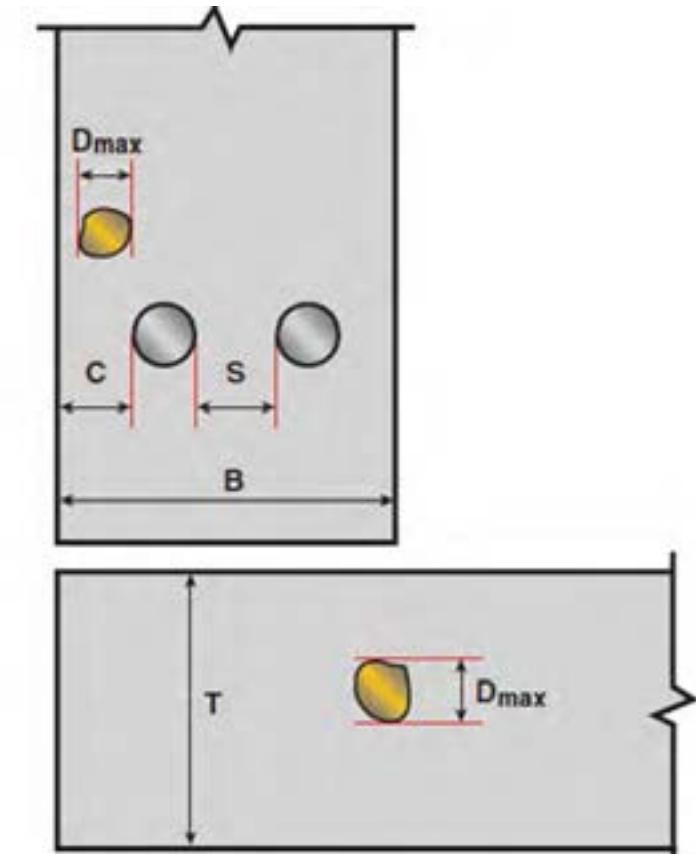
ACI 318 requirements for nominal maximum size of aggregates,  $D_{\max}$ , based on concrete dimensions, B, T, and reinforcement spacing, S.
